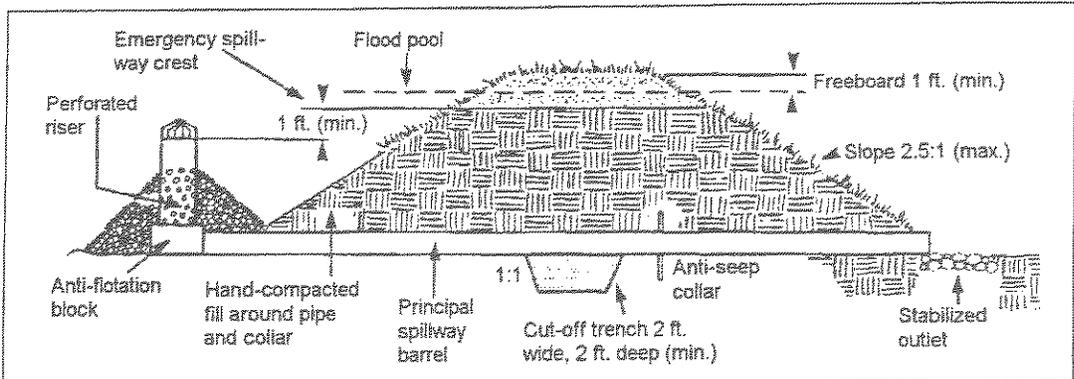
B. Cross section of a temporary sediment basin principal spillway and embankment.
